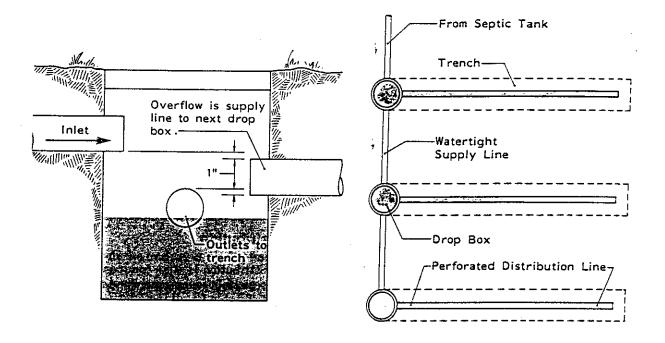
Cross section and plan view of a drop box. Drop boxes come in concrete and plastic. The covers must must extend to the ground surface for easy maintenance (MWPS-24, 1982).
